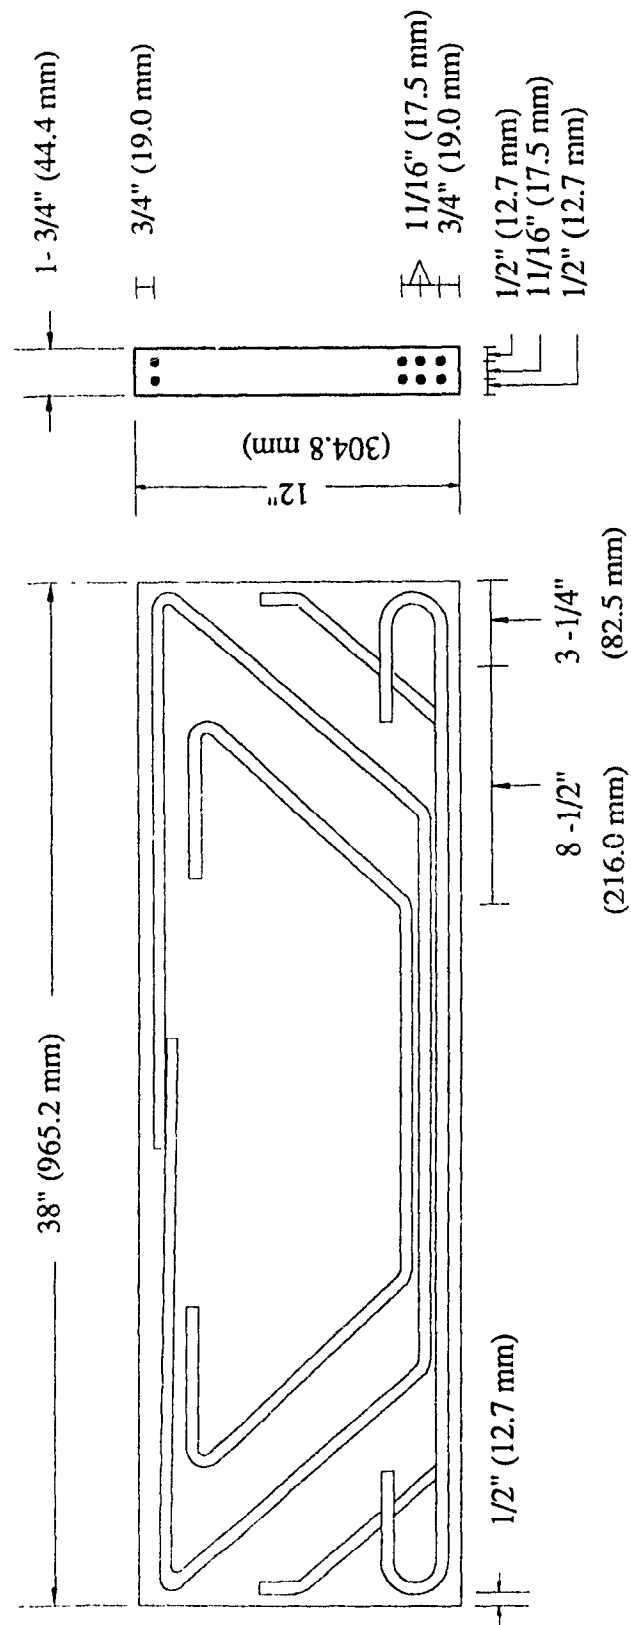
Reinforcement details for sample series 'B', 'A7g' and 'B7g'
